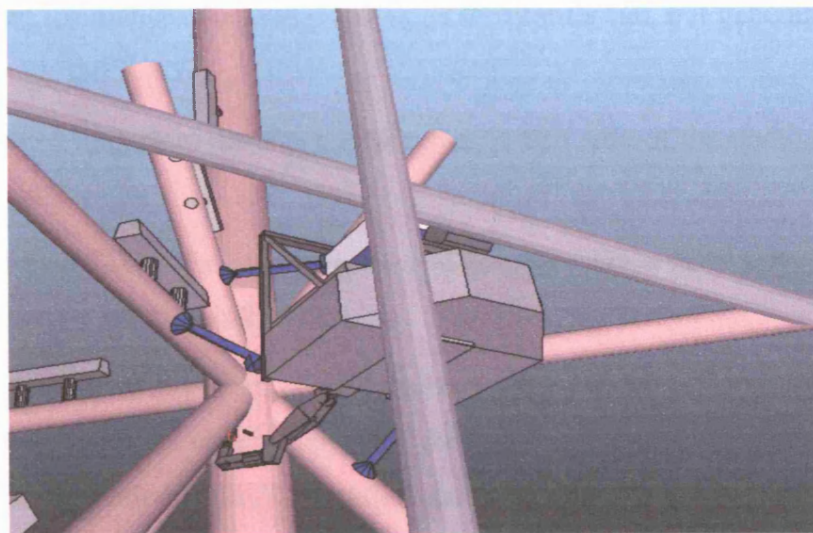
Seal ROV inspecting a weld from the edge of the conductor guide frame
